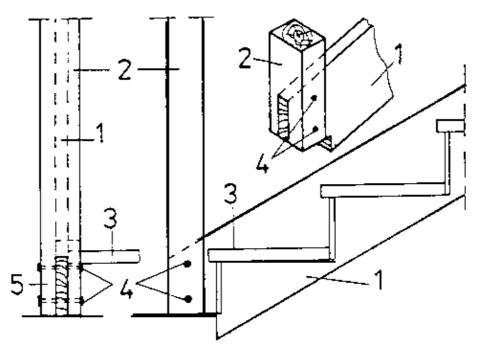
Lap joint between railing post and outer string – 1 outer string, 2 railing post, 3 bottom step, 4 machine screw, 5 lap joint
